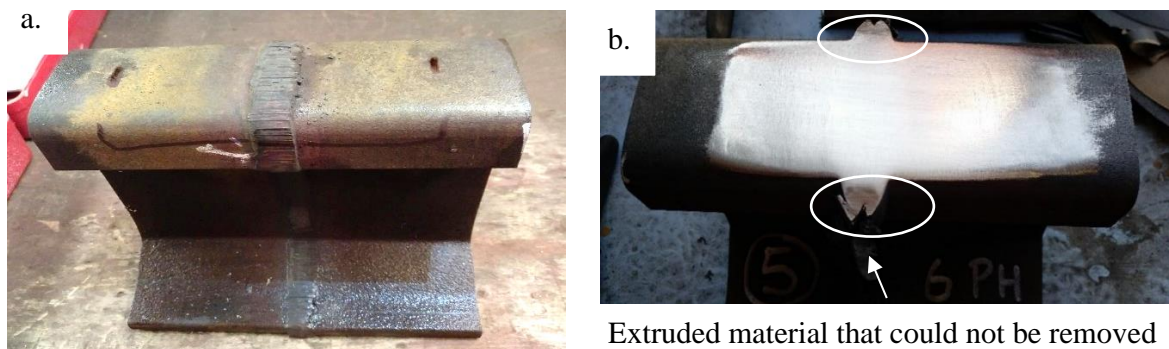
Section of 20 cm of a rail welded with 6PH cycles and quenched at 200°C, a. 6PH weld quenched at 200 °C, after cutting; b. 6PH+3PWP weld quenched at 200°C, after cutting and polishing.
